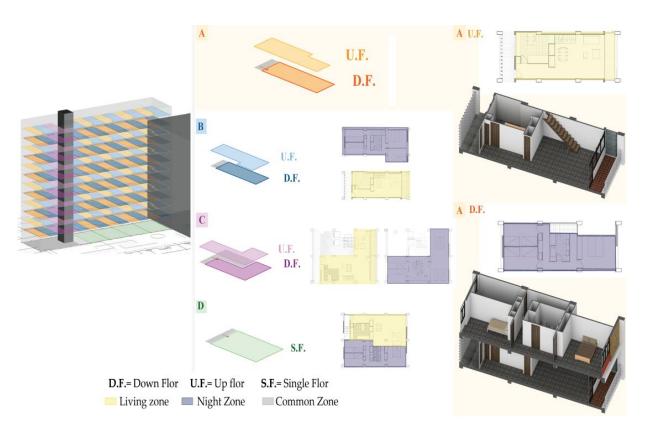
Housing types in building no. 2 and distinction between living and night zones: Type A, duplex dwelling with terrace with three rooms; Type B, duplex dwelling with terrace and four rooms; Type C, duplex dwelling with terrace with three rooms; Type D, One floor dwelling with three rooms. Axonometric cross-sections of unit 27 representing the type A building 2, duplex, 120 m². © 2024, authors.
